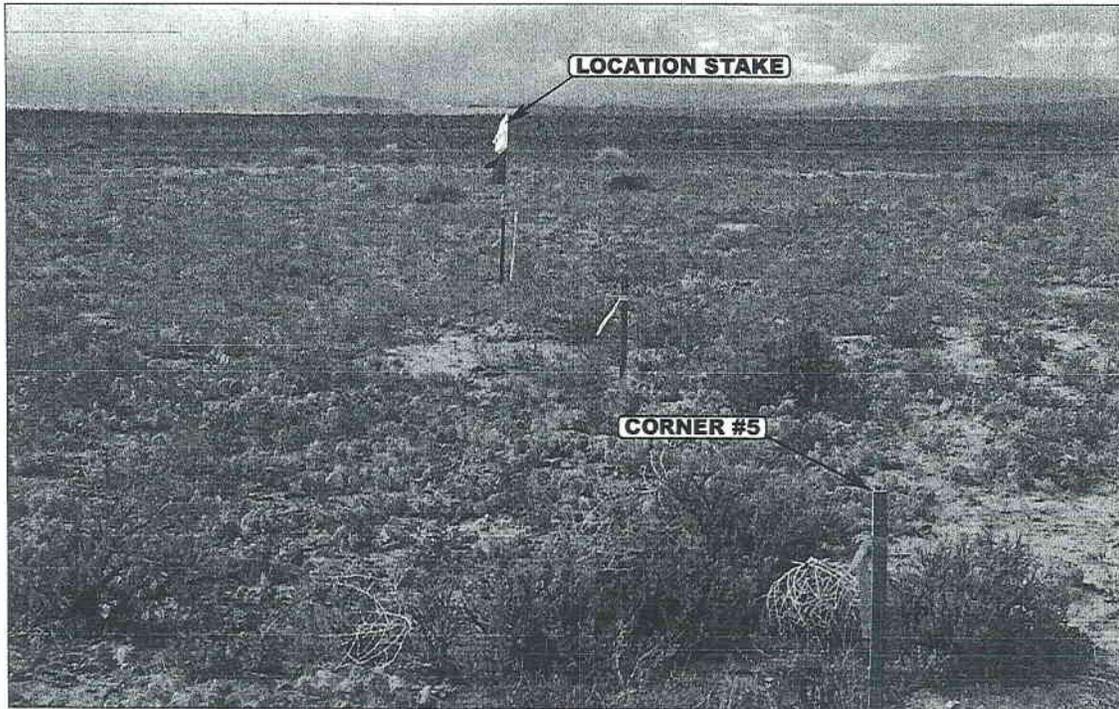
PHOTO: VIEW FROM CORNER #5 TO LOCATION STAKE
